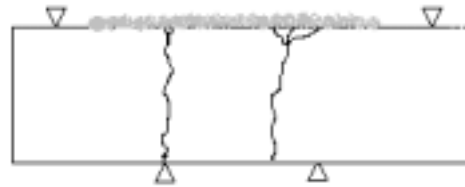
Typical failure mode of beams strengthened with the Tyfo® glass system for shear at 45°.
